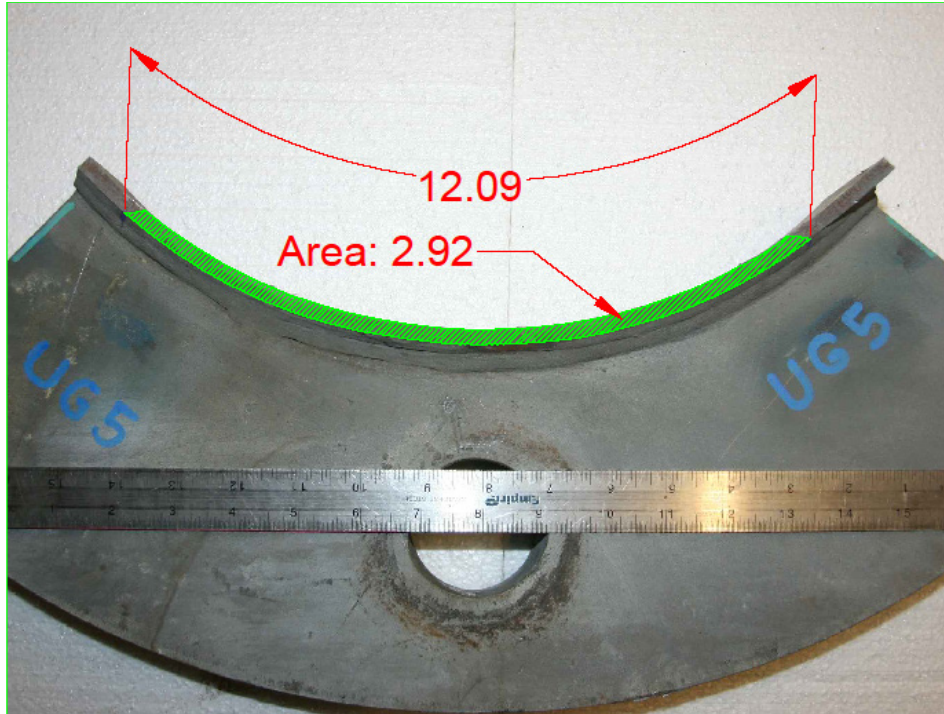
Photo. Specimen 1G5 fracture surface.
